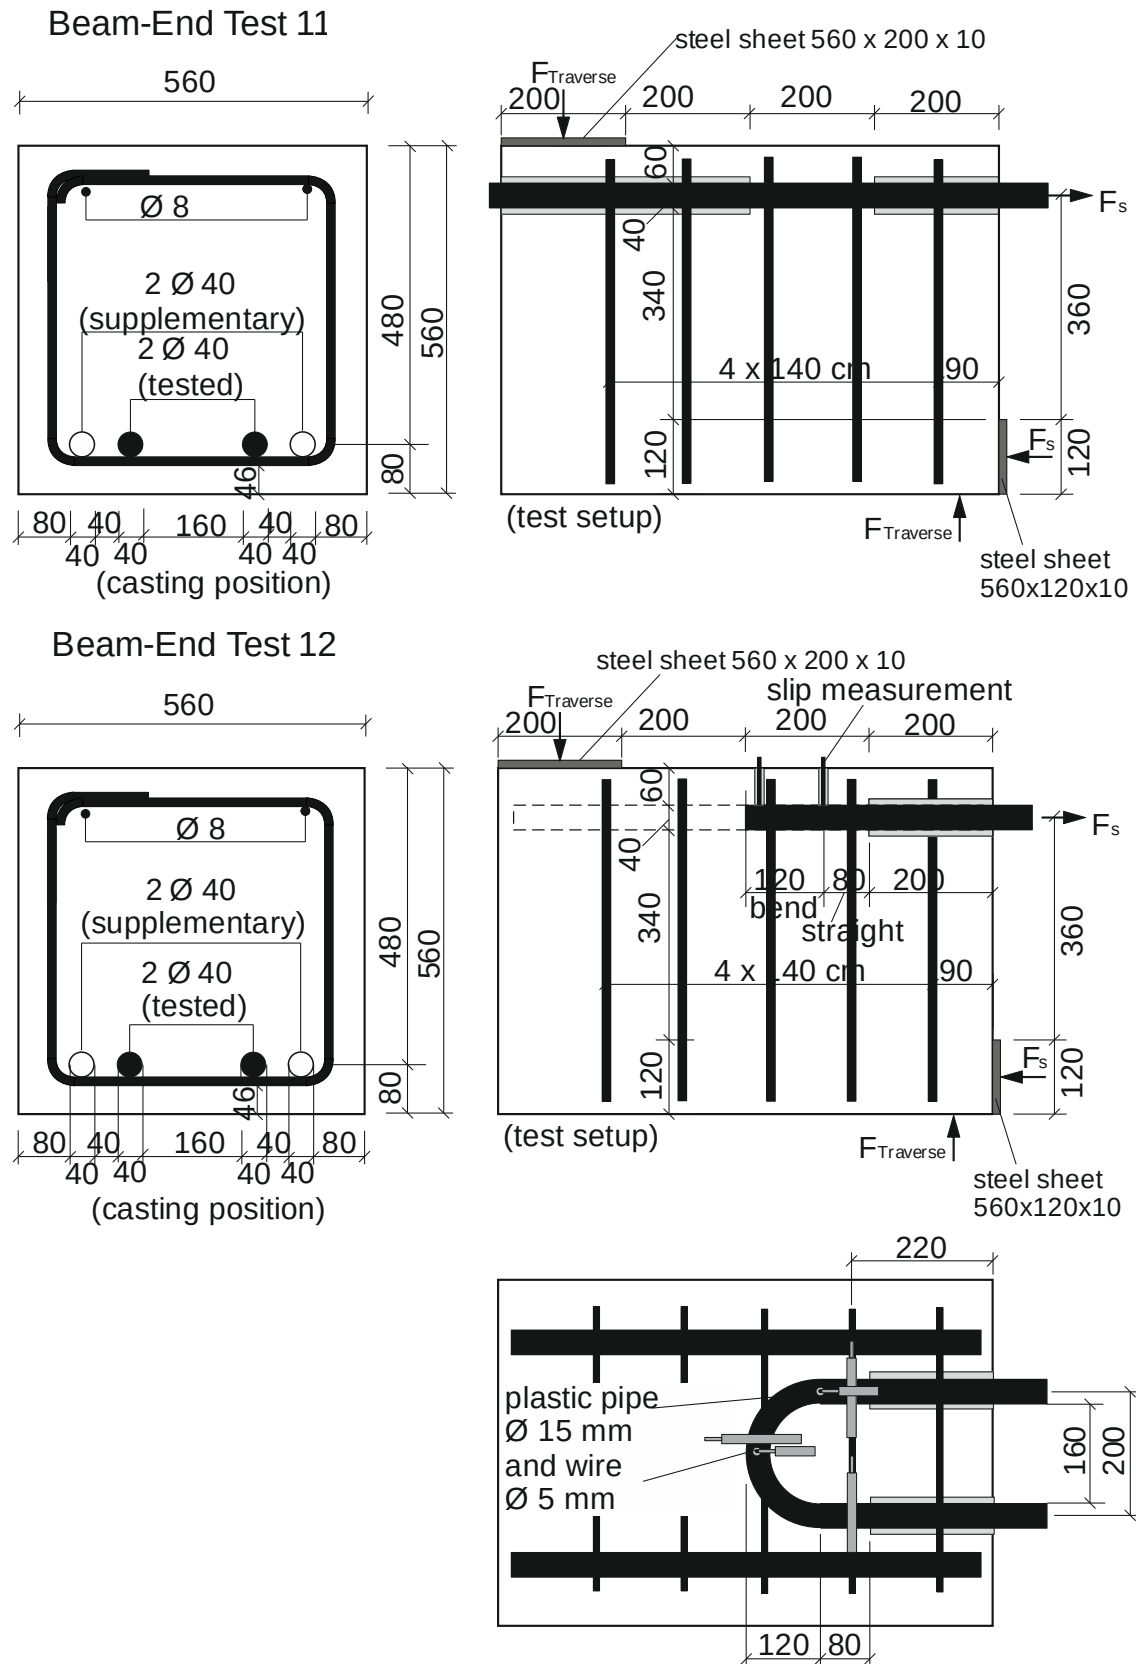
Reinforcement layout of Beam-End Tests 11 and 12
